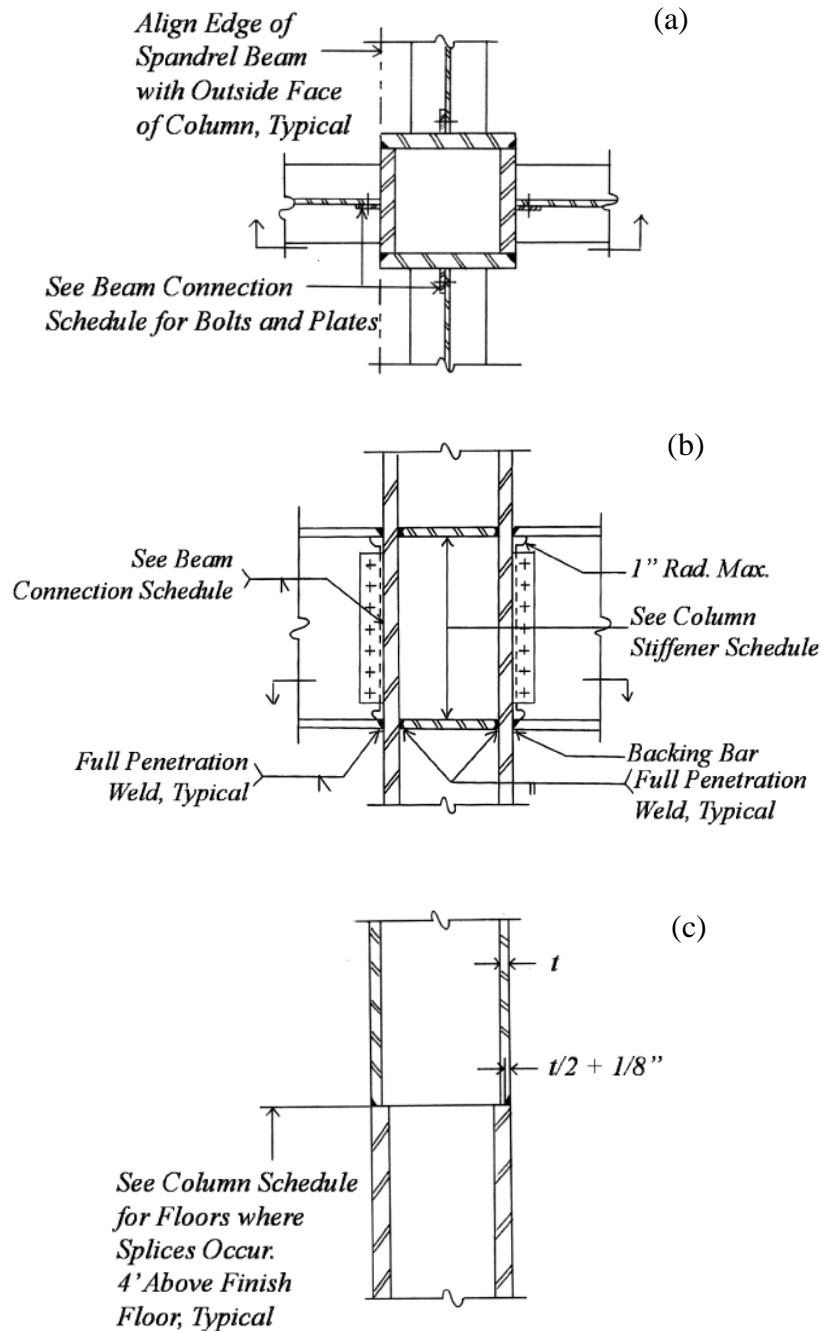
Typical details observed in existing building drawings: typical moment connection plan view (a) and elevation (b); typical splice connection (c).
